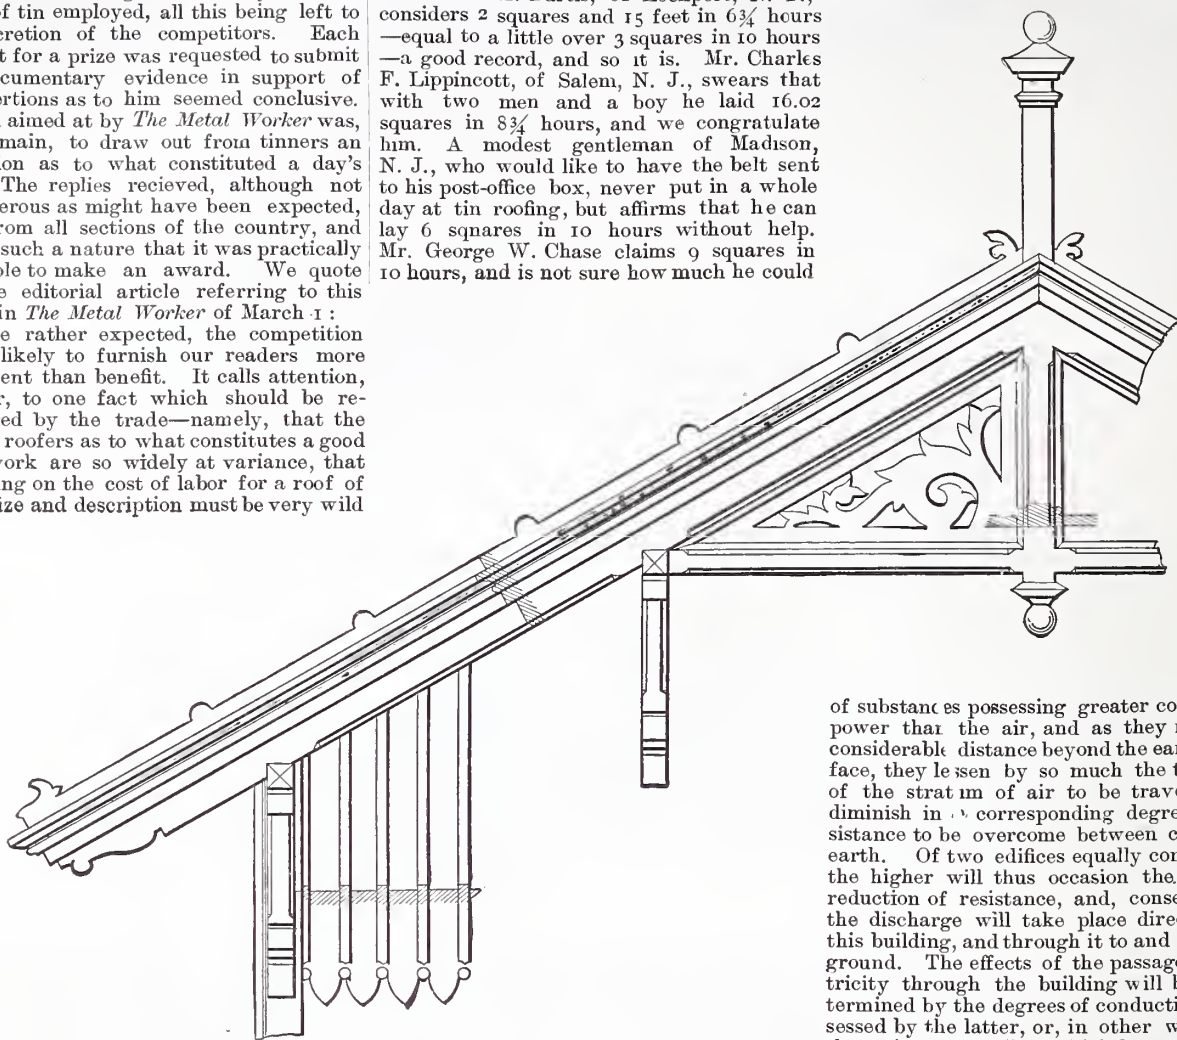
Detail of Gable Finish.—Scale, ½ inch to the Foot.
